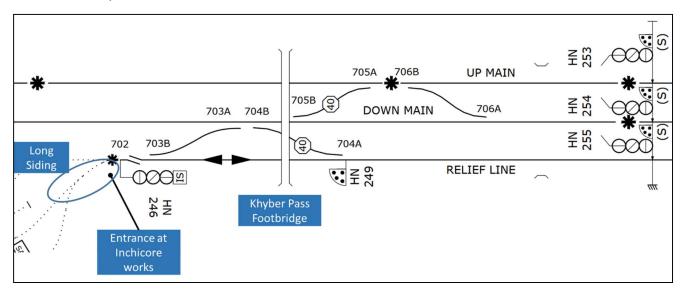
Track layout in the vicinity of Khyber Pass Footbridge (OBC5)
